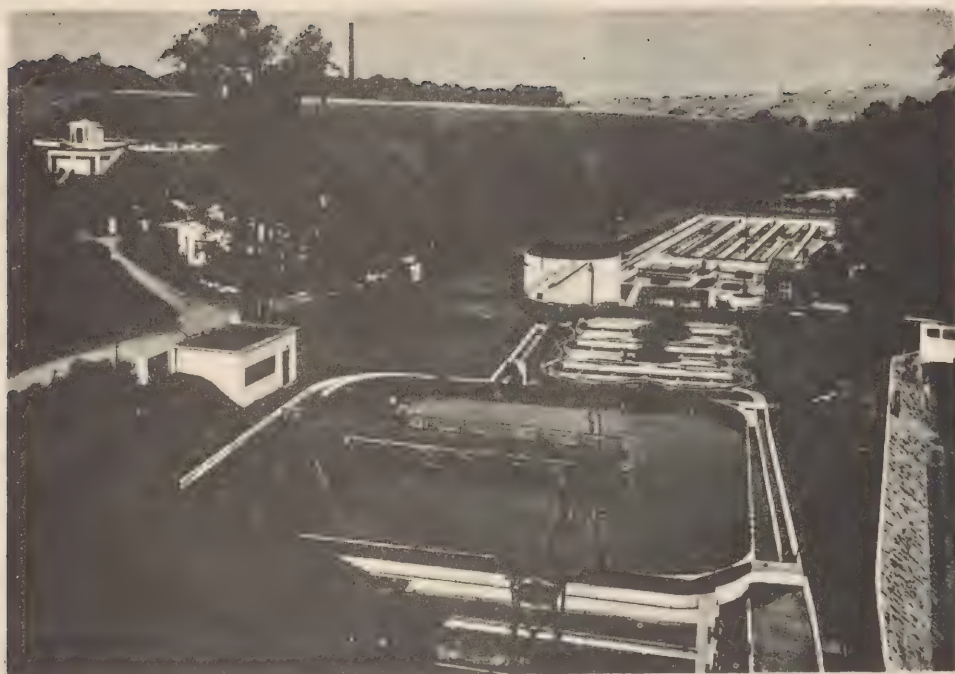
a, Essen-Rellinghausen Sewage Plant
